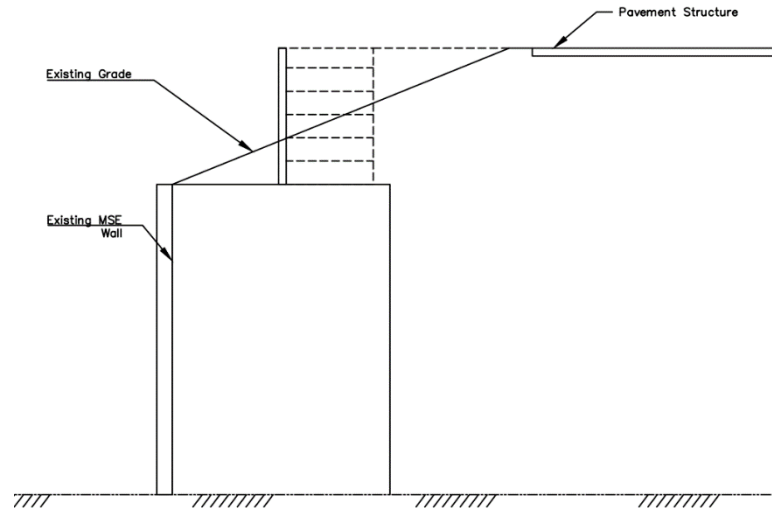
Roadway Widenings on Top of Preexisting MSE Walls
